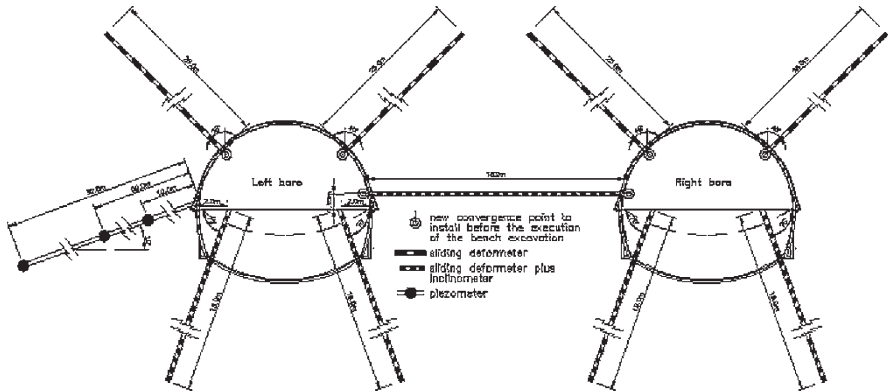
Cross section of twin tunnels showing locations of sliding deformeters and piezometers (Grasso et al. 2003)
